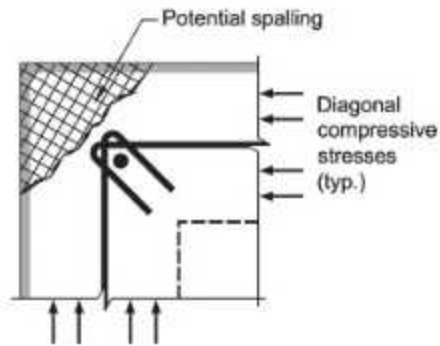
Spalling of corners of beams under torsion.
